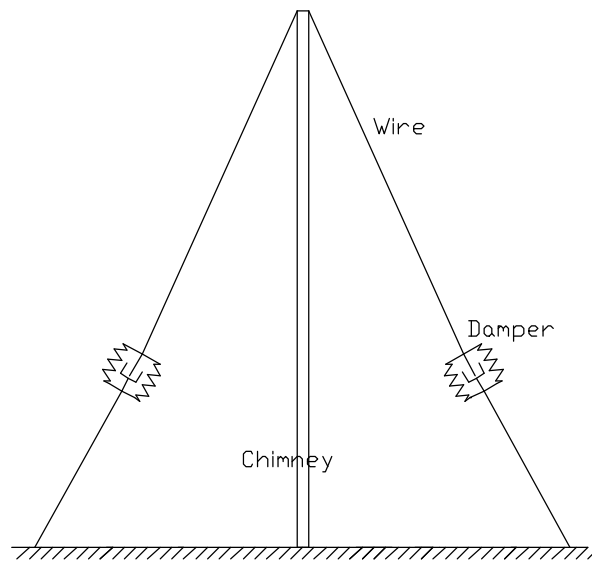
b The chimney is damped by using prestressed wires with spring-damper elements.
